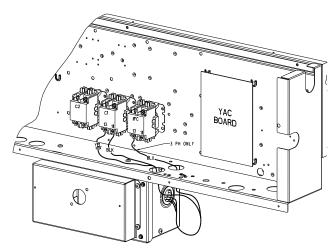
Location of Non-Fused Disconnect Enclosure To field install the NFD shaft and handle:
